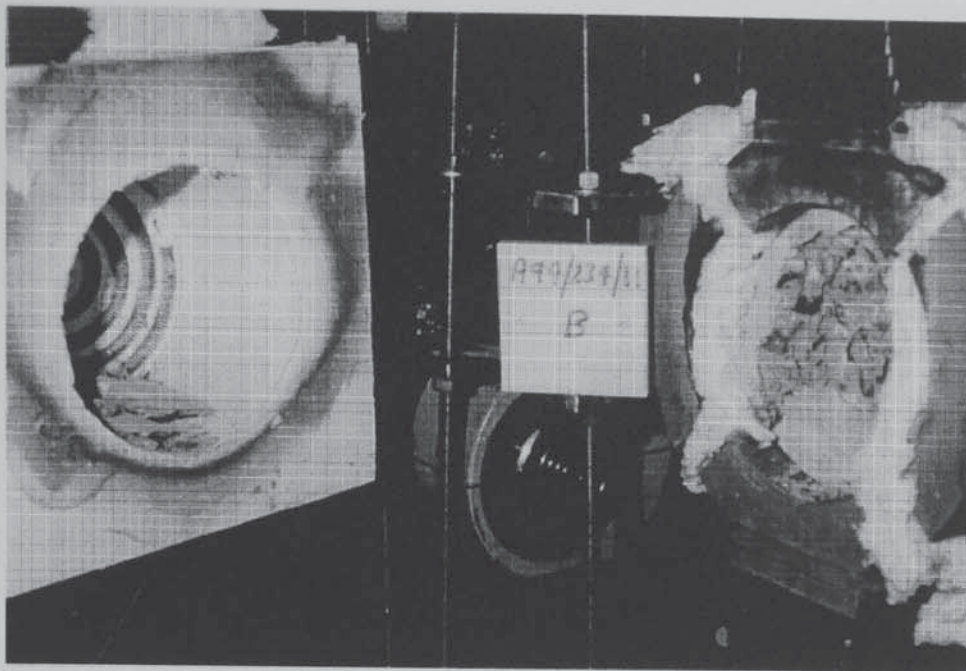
Violent explosive spalling damaging heaters
